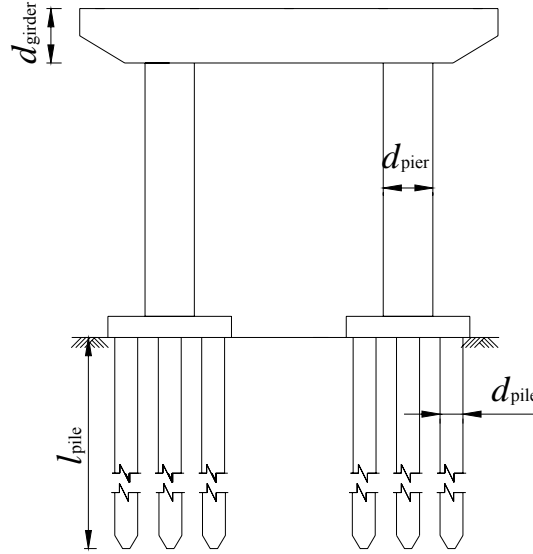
Reinforcement concrete pile-pier-capbeam frame
